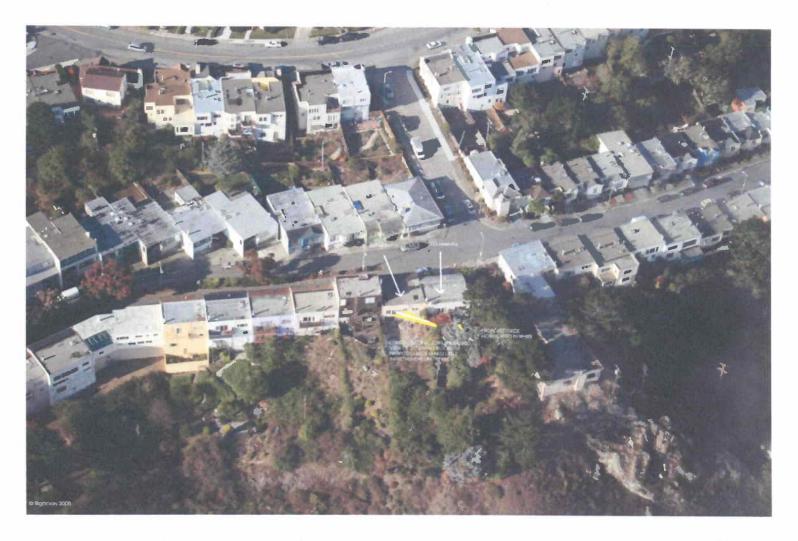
Exhibit C: This aerial photo, provided by DR applicant, shows pattern of development with decks and additions in immediate vicinity. It is important to note that DR applicant shot this photo prior to construction of his rear deck in 2008. Refer to site plan, Sheet A1, that shows size and location of DR applicant's existing deck.
